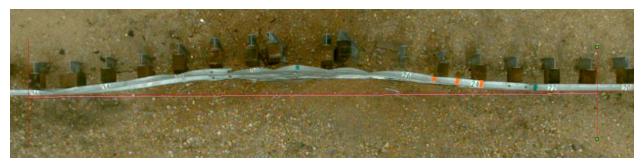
Width of Noticeable Damaged Section of Quarter Post Spacing System
